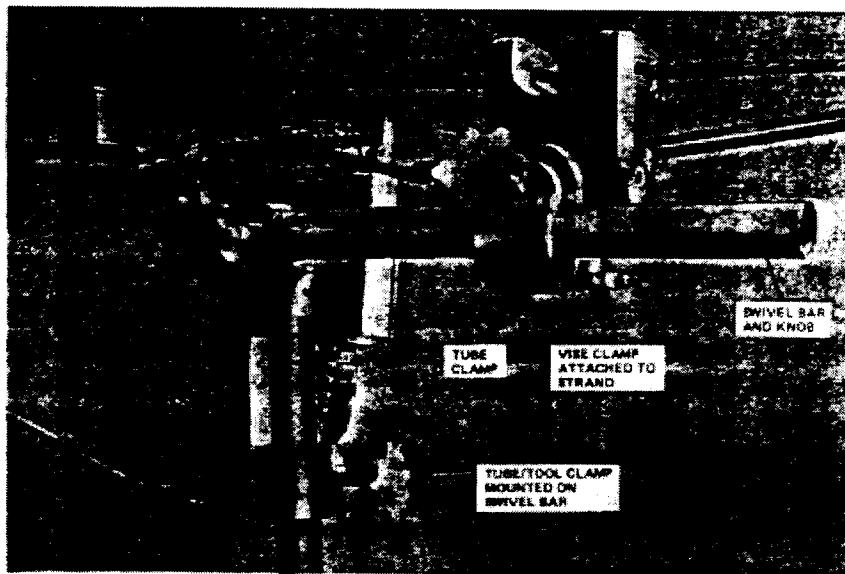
Method of Setting Up Splicing Tool on Strand
